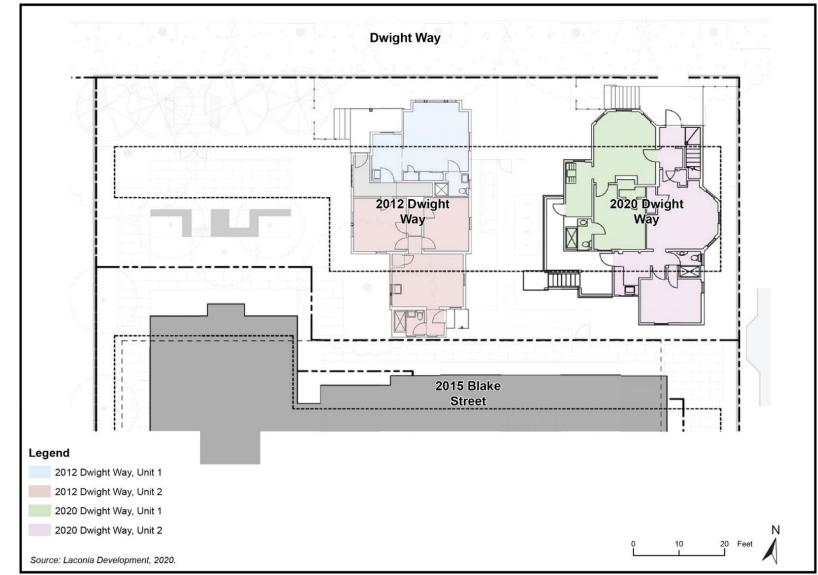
Proposed Site Plan – 2012 and 2020 Dwight Way
